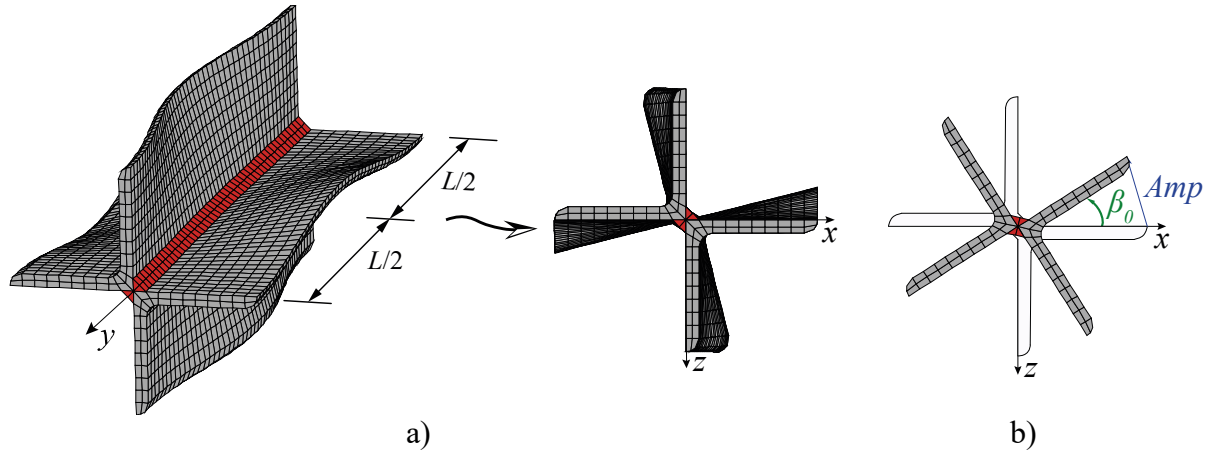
a) Welded starred column geometry with initial geometrical imperfection and b) mid-span ($L/2$) cross-section torsional rotation.
